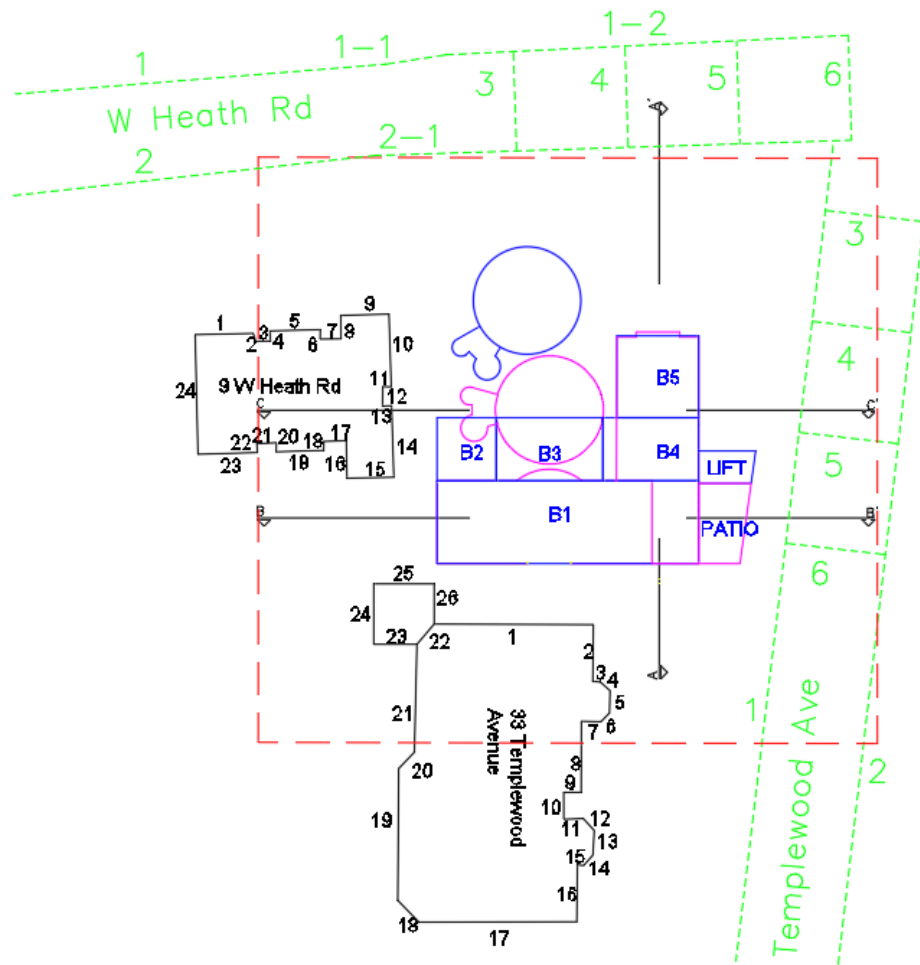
Simplified scheme and nomenclature for building façade/masonry wall elements (black), existing (magenta) and proposed (dashed blue) schemes, street movement monitoring areas (green) and excavation zone of influence (dashed red).
